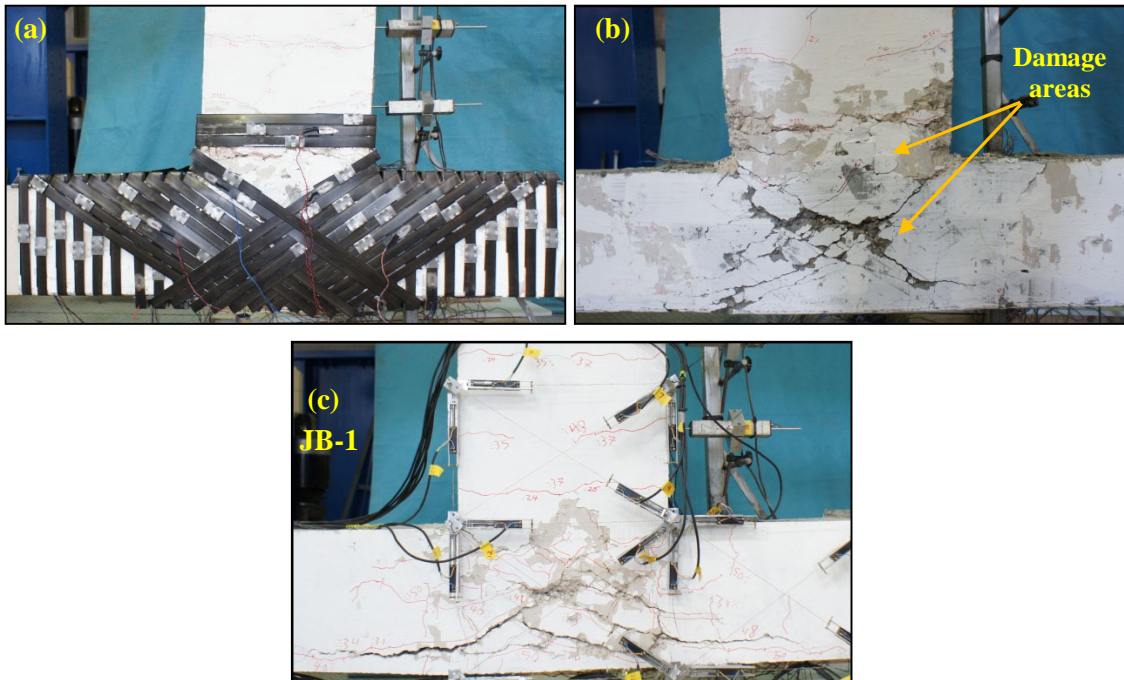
Final cracking pattern a) with strips installed, b) after removing the strips and c) unit JB-1
